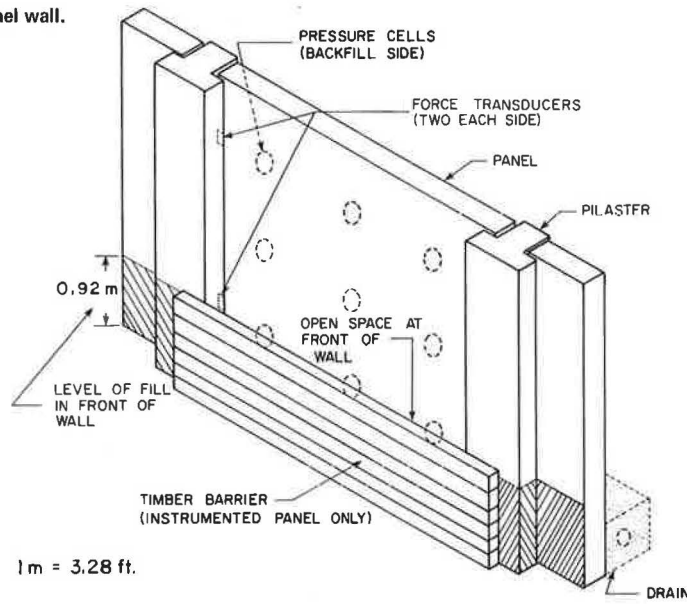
Location of earth pressure cells and force transducers, panel wall.
